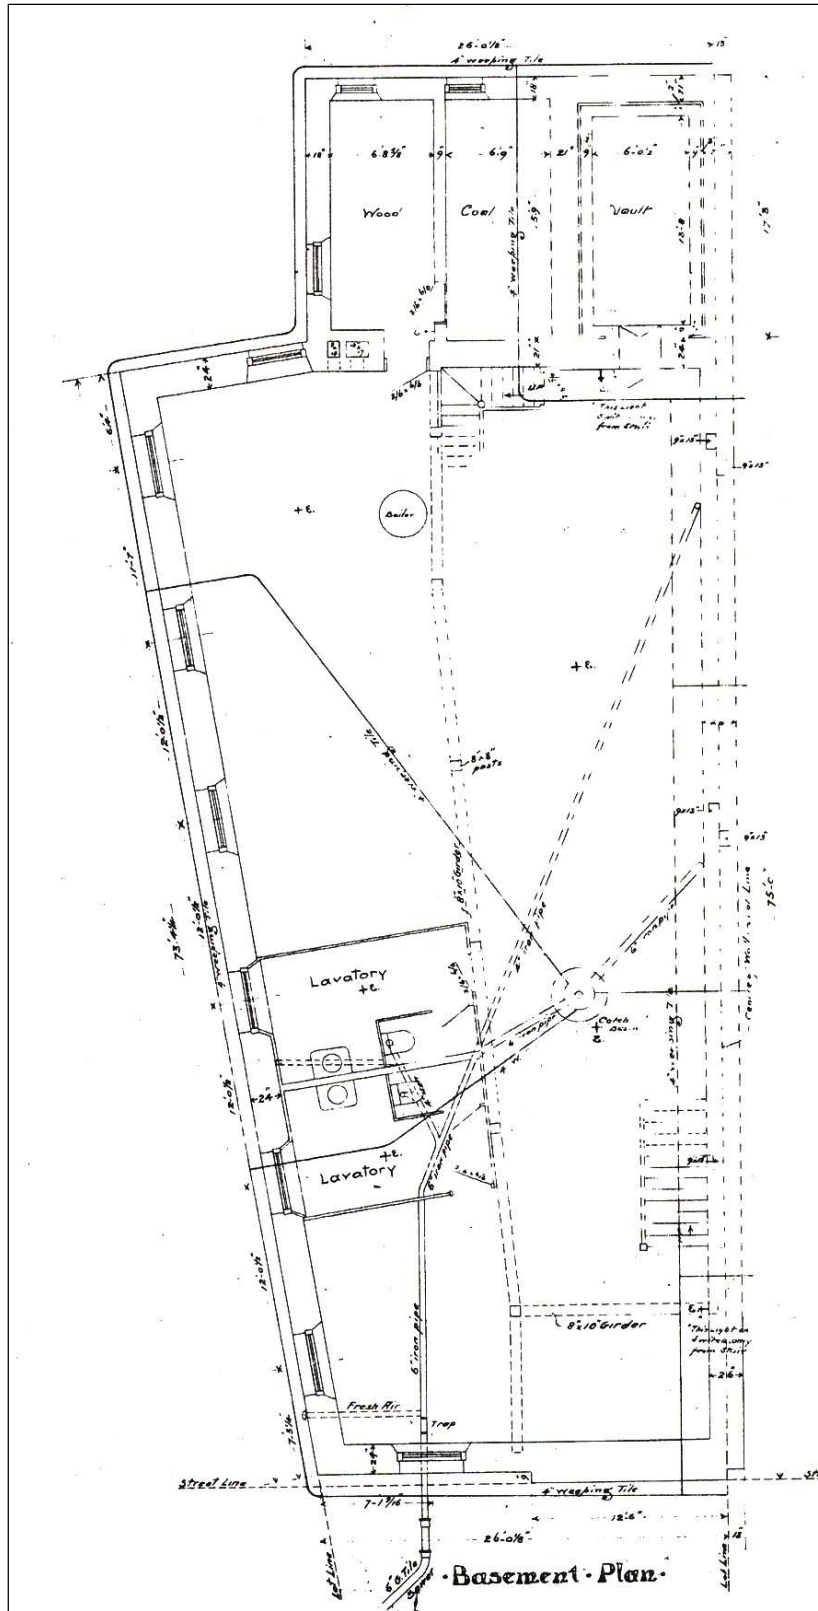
Architect’s Plans, “Basement Plan,” 1901. The rear section is small and only one storey high. The broken line at the rear of the building indicates the lot boundary. (Courtesy of the City of Winnipeg Archives, Plan #961/1901.)
